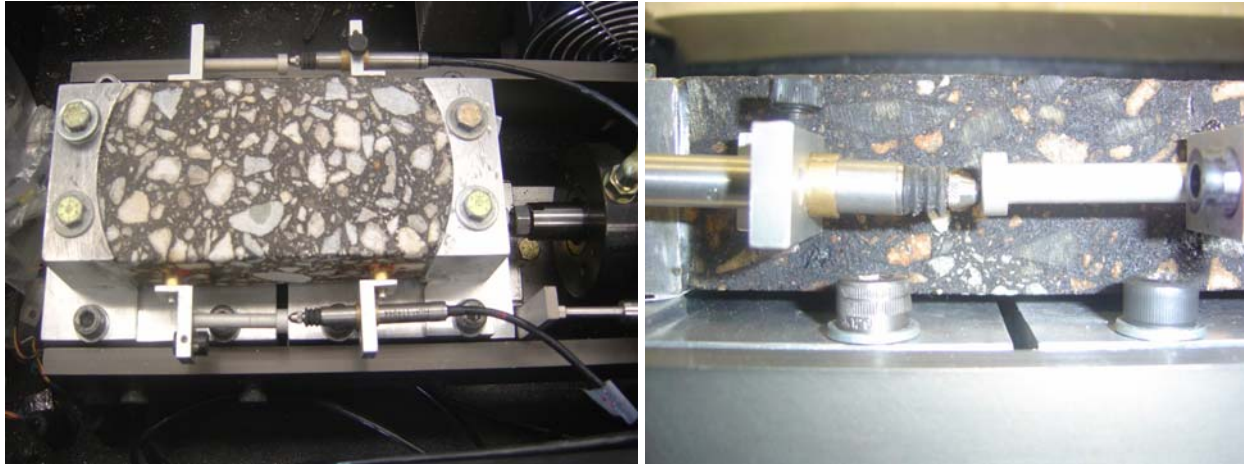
External LVDTs and Overview of LVDT Mounted Specimen.
